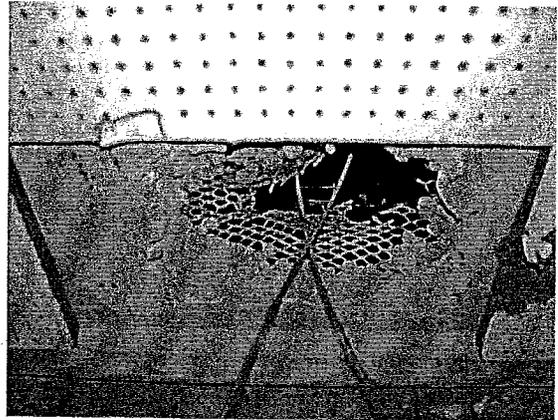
Plaster on ceiling, 2nd floor west corridor (location 083, sample 01-02-67-S032).
